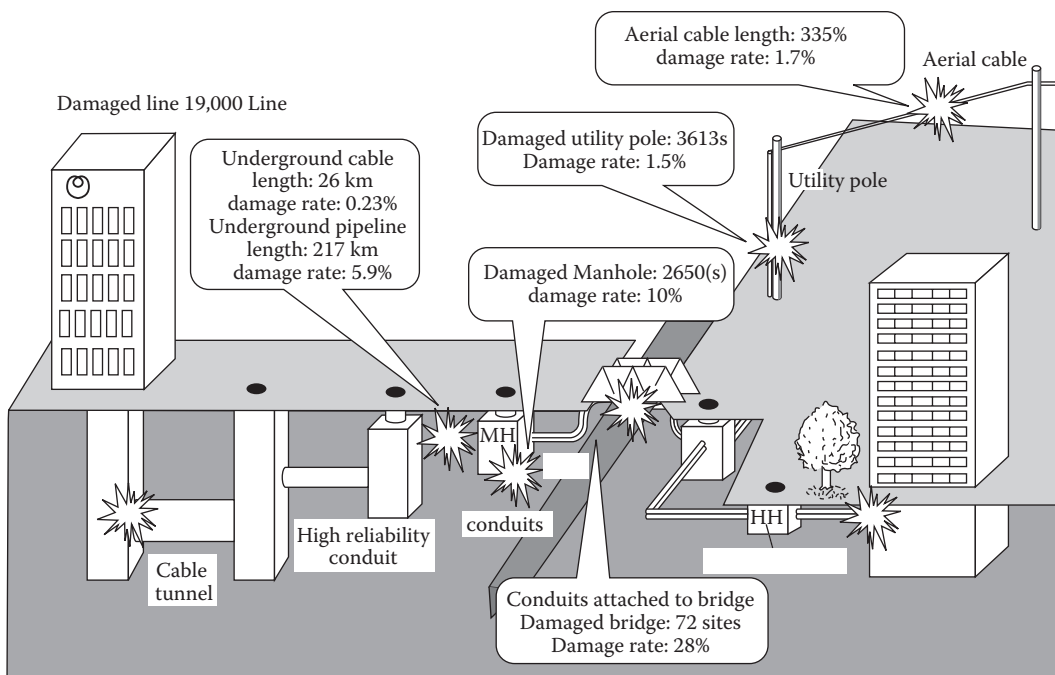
Damage of outside facilities (Kobe earthquake).
